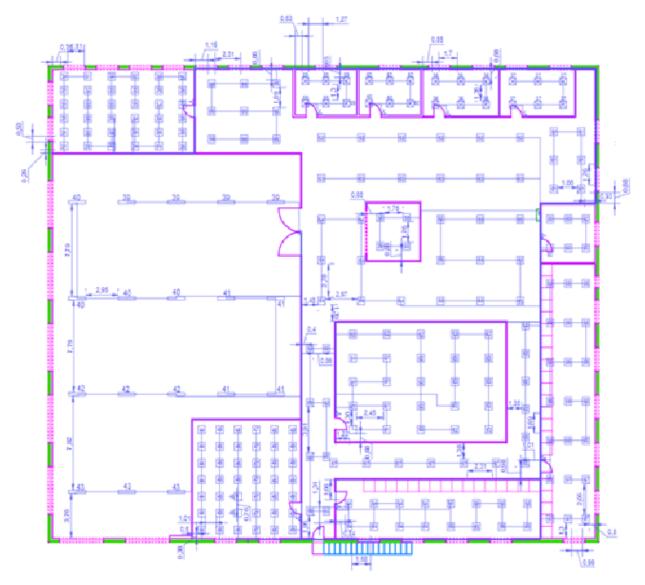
Lighting installation on the building plan (example) (source: own elaboration)
